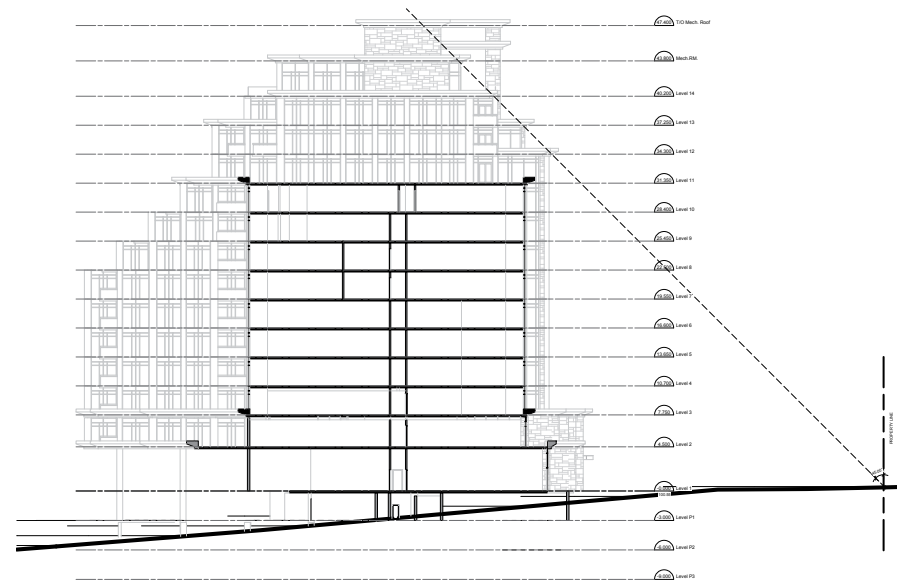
Proposed development at 2500 Bloor Street West (Building A), Cross Sections with Angular Planes
